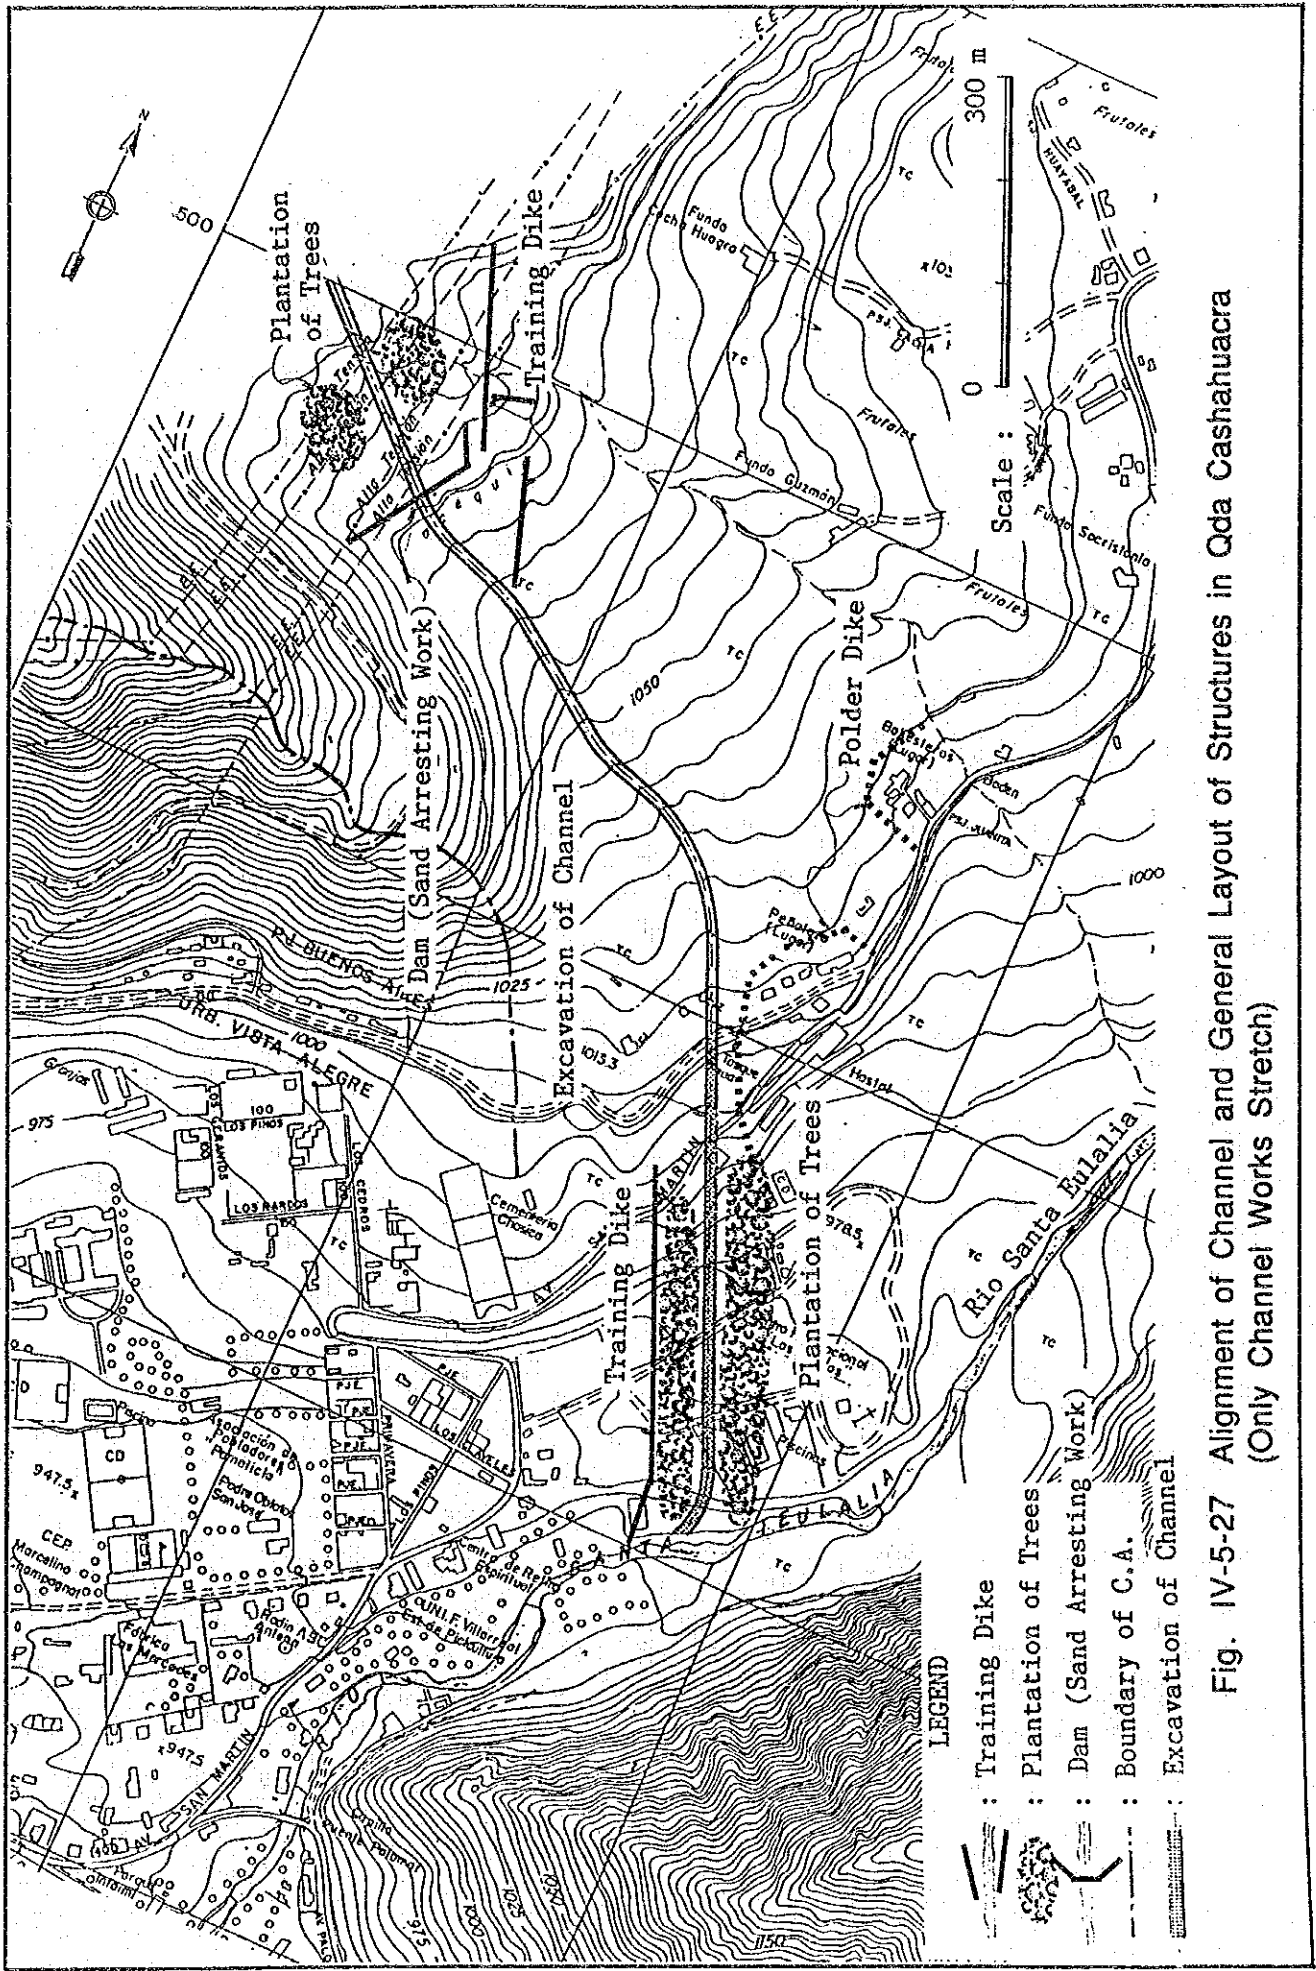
Alignment of Channel and General Layout of Structures in Qda Cashahuacra (Only Channel Works Stretch)
